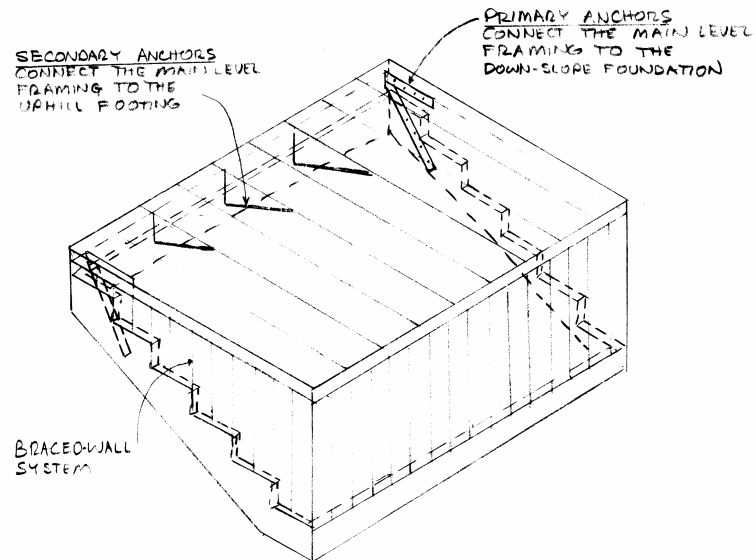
Retrofit anchored-bracing system for braced-wall house
